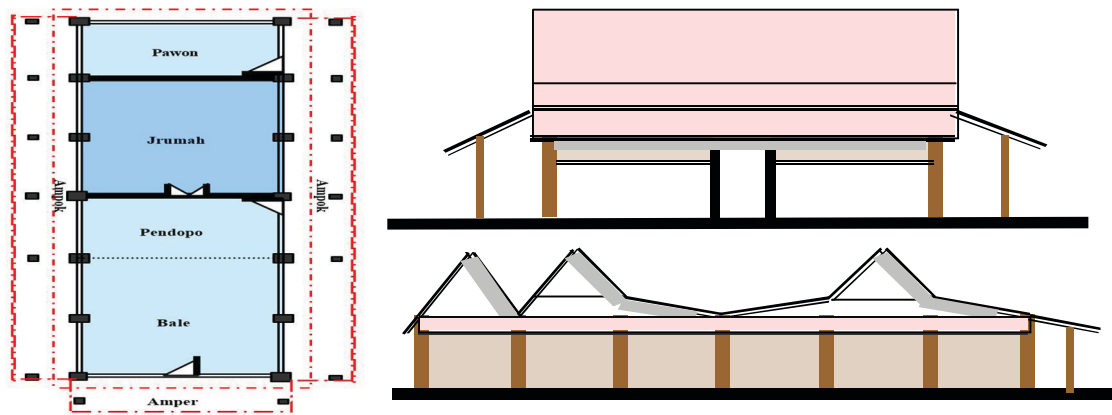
Lay out the spatial division and look at the traditional houses of the Tengger Village of Wonokitri Village
